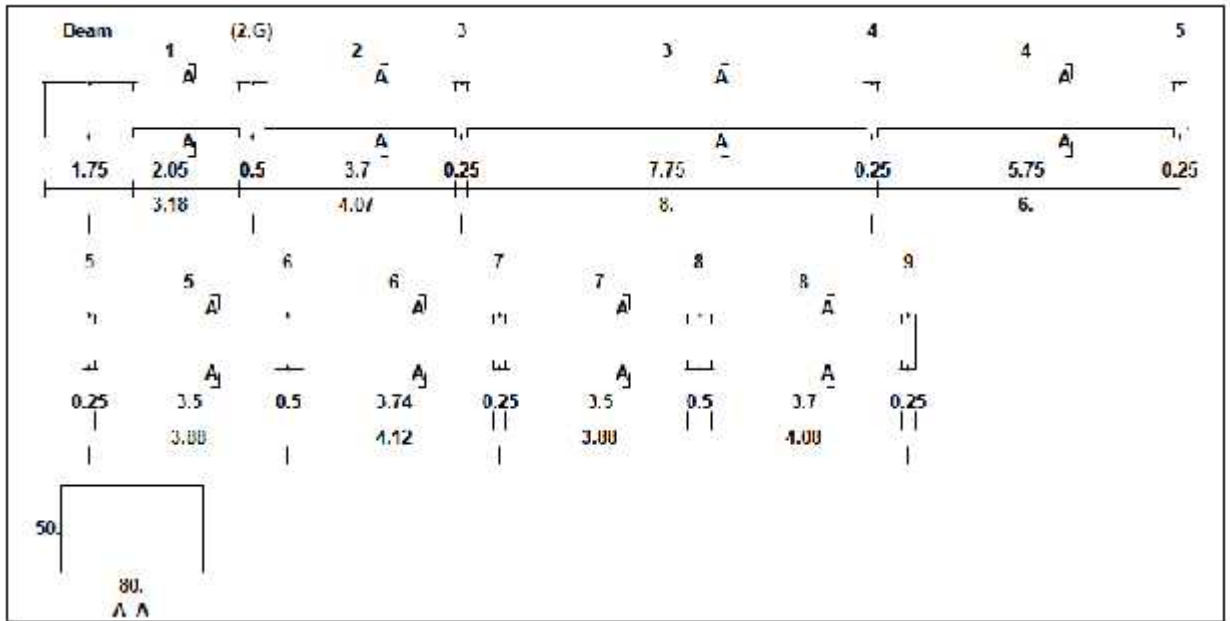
11) Beam Geometry (B2, G) (m)
